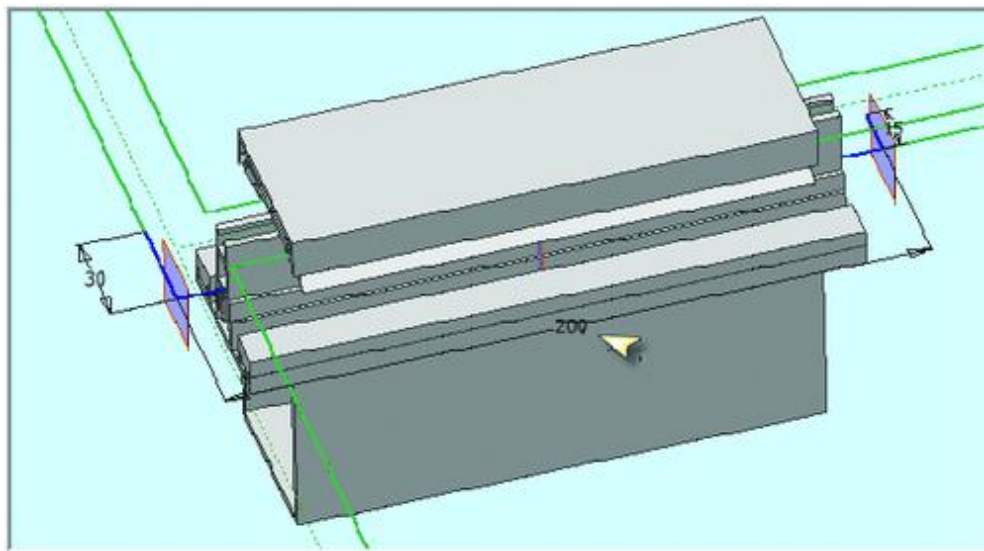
Typical transom assembly before establishing connection with the geometry of the main frame
